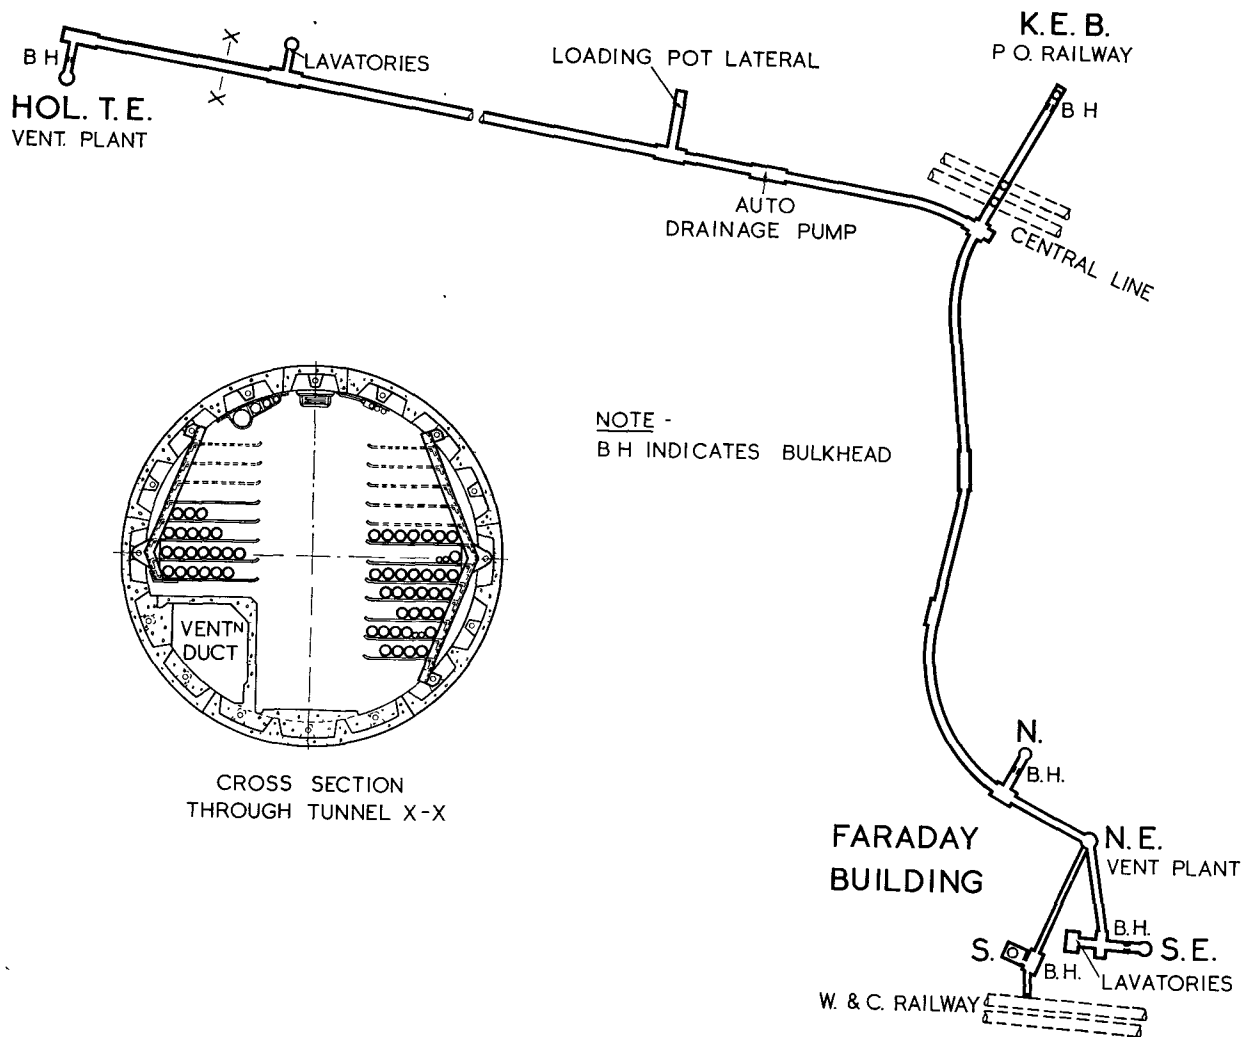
TYPICAL POST OFFICE 7' 0" DIA. CABLE TUNNEL.
